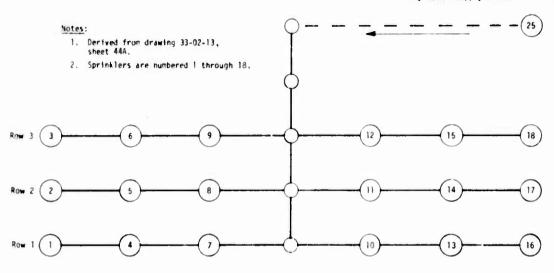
Small Sprinkler System in Buildings 350, 368, and 660 at Robins Air Force Base
